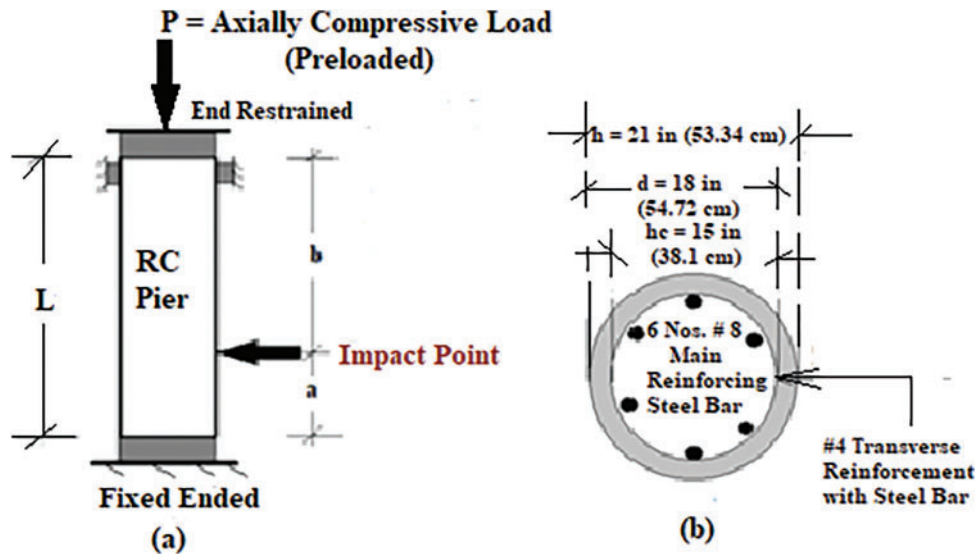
(a) Pier end conditions, and (b) pier cross-section
